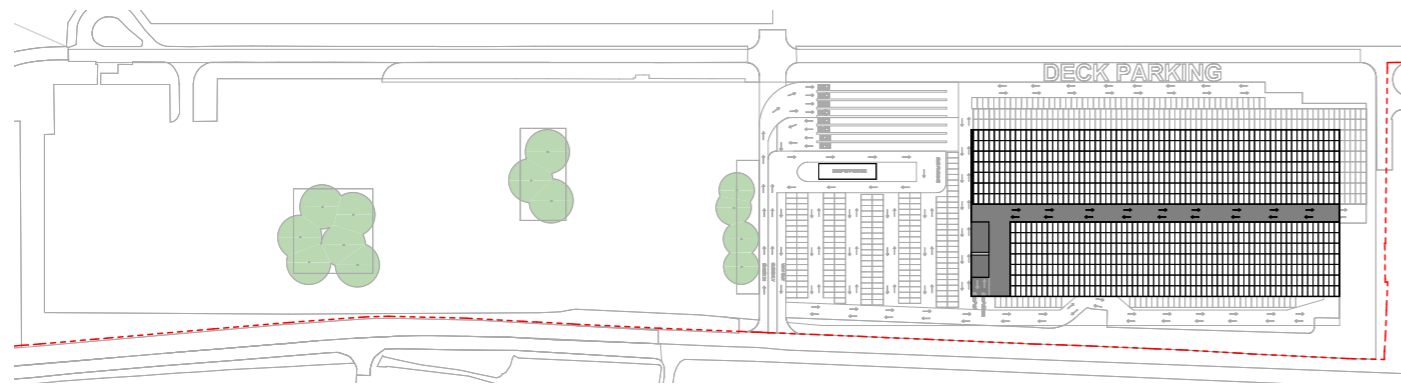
Indicative First Floor Plan - Car park X Deck Parking
